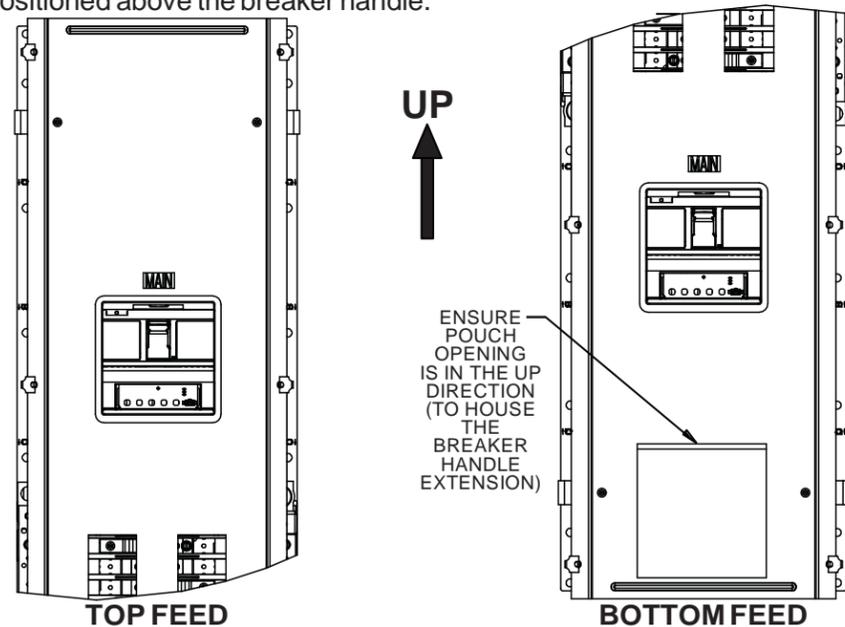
Top & Bottom Feed Deadfront Filler Installation
